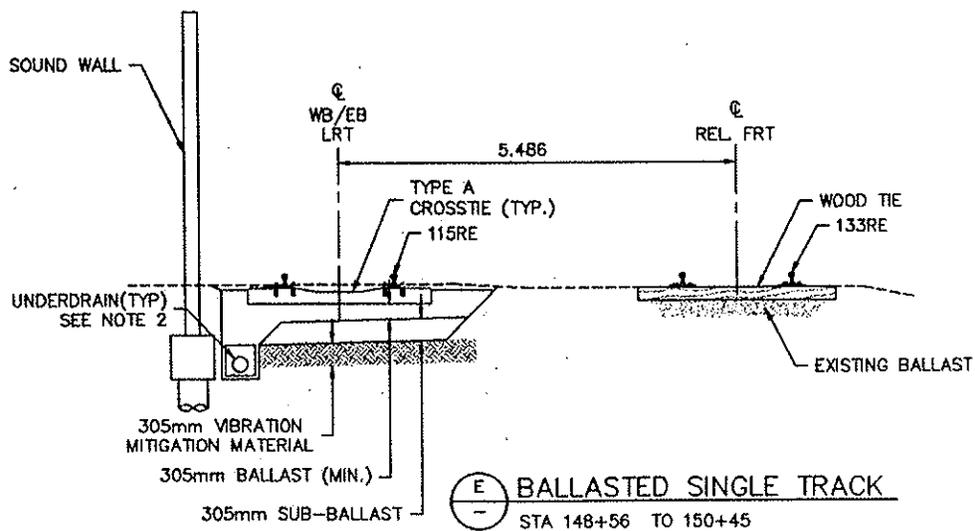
Typical cross section of Vasona Light Rail Project (Korve Engineering, 2001).
